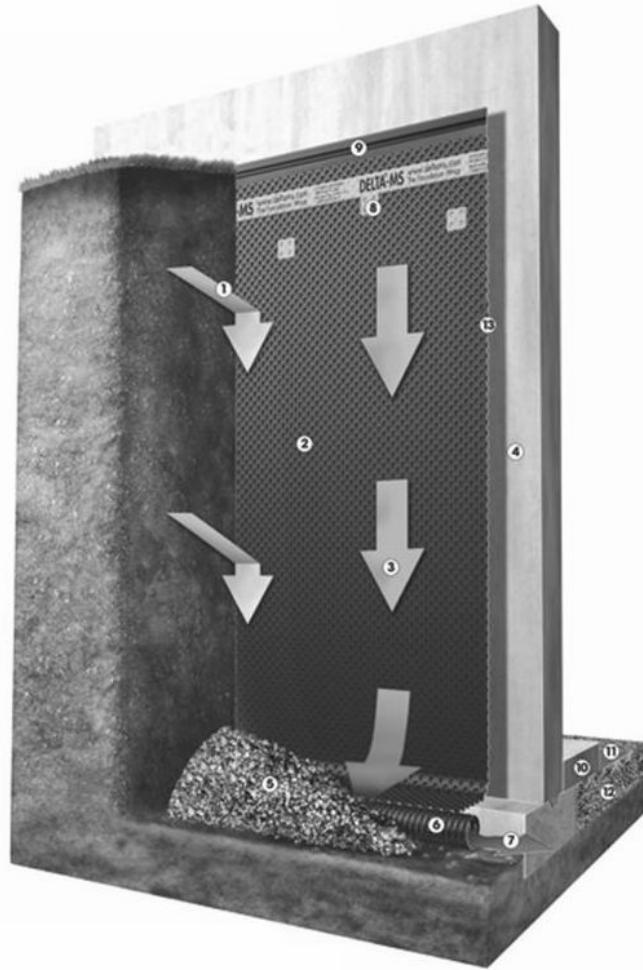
Drainage Pattern with Delta-MS Exterior Foundation Waterproofing Membrane. (Photo courtesy of Cosella-Dörken Products, Inc.)
